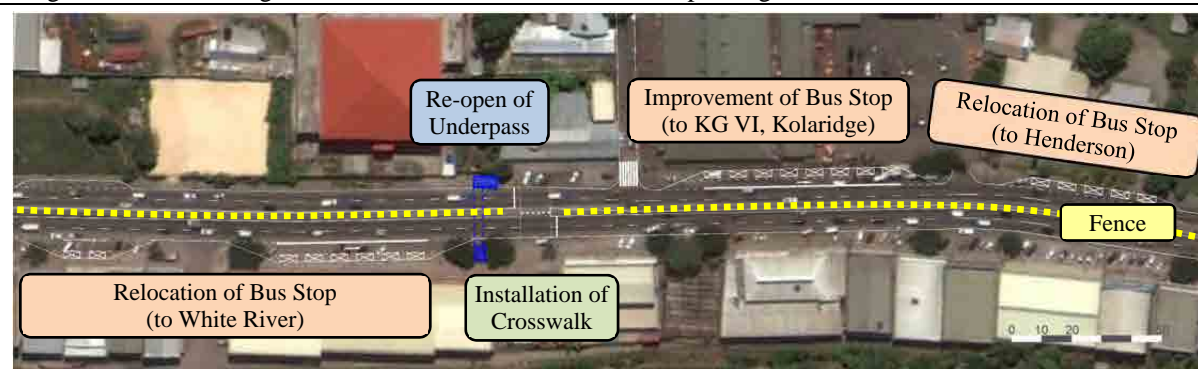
Alternative Schemes of Project Facility Layout around the Central Market
